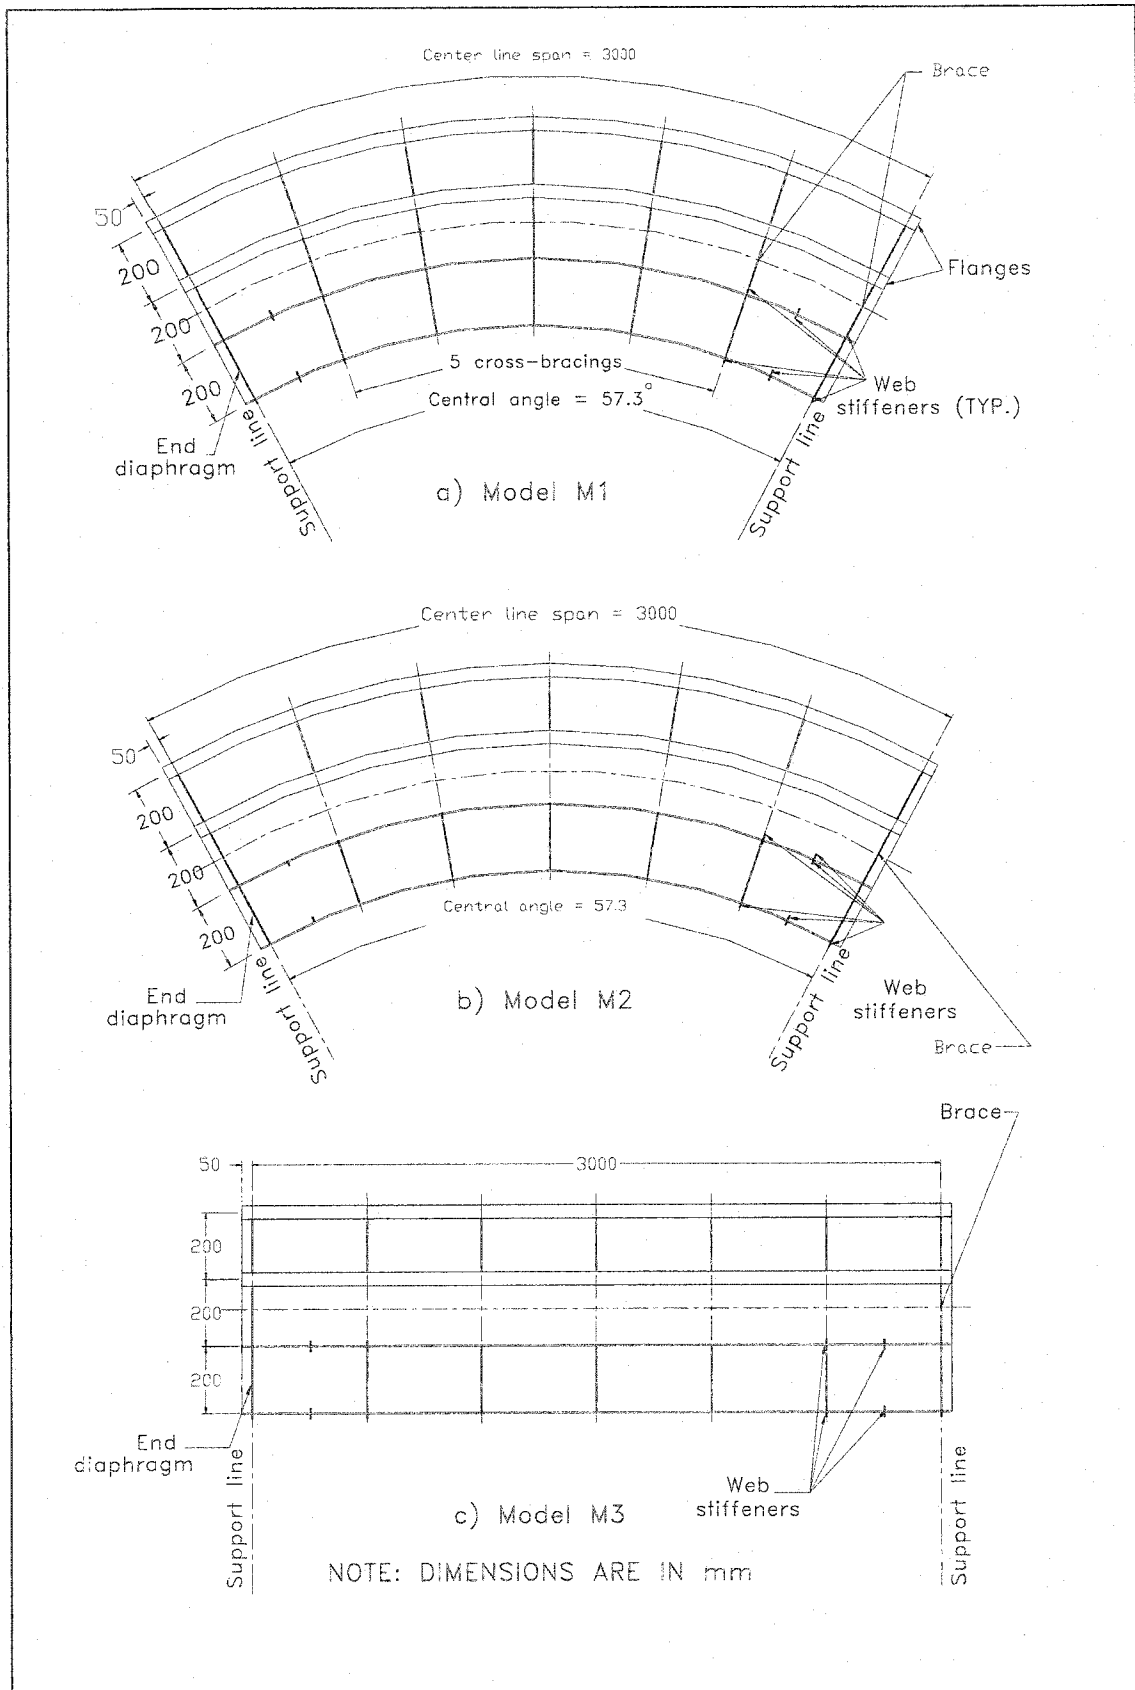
Plan view of without the concrete deck slab (see section a-a in Fig.3.1)
